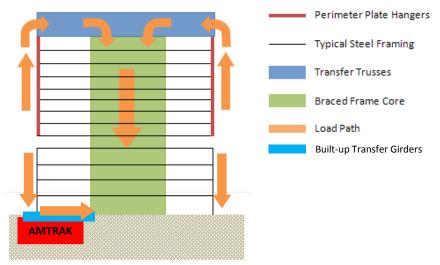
Schematic Diagram of Existing Tower Design Load Path
